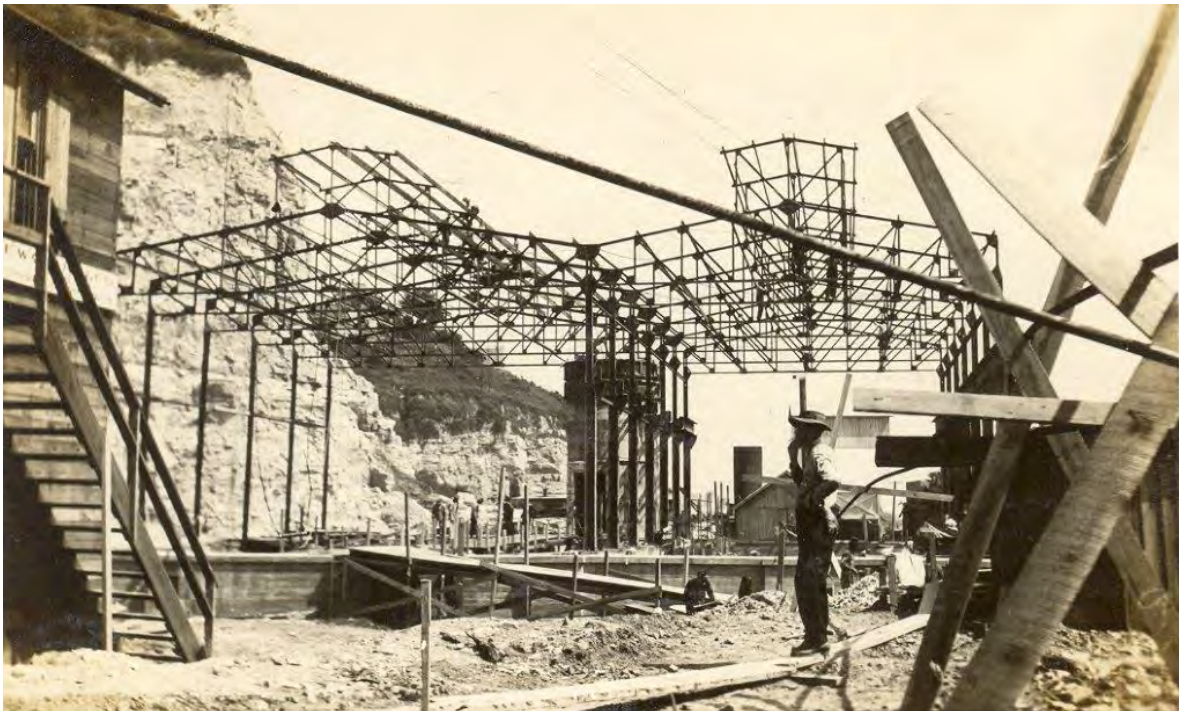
Power House under construction, 1913. Note limestone bluff on left and smoke stack being constructed at center of image. Photo courtesy of Robert Abbott.
